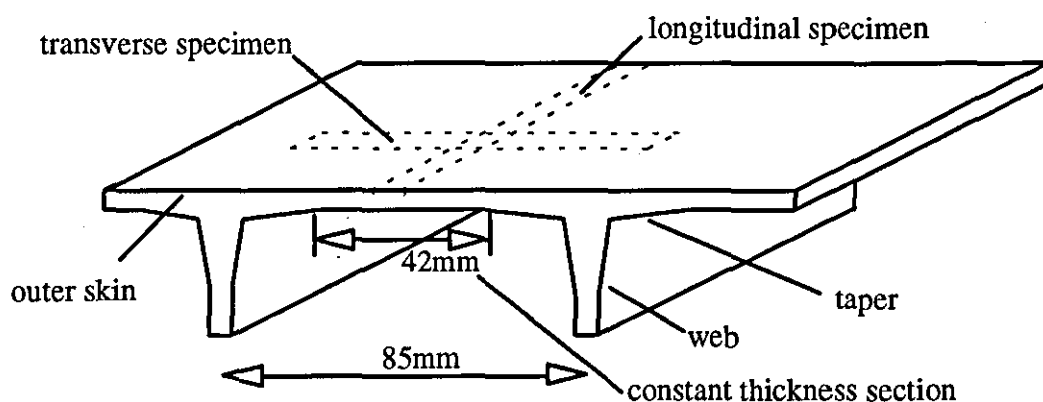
Static mechanical test specimens cut from ACCS plank.
